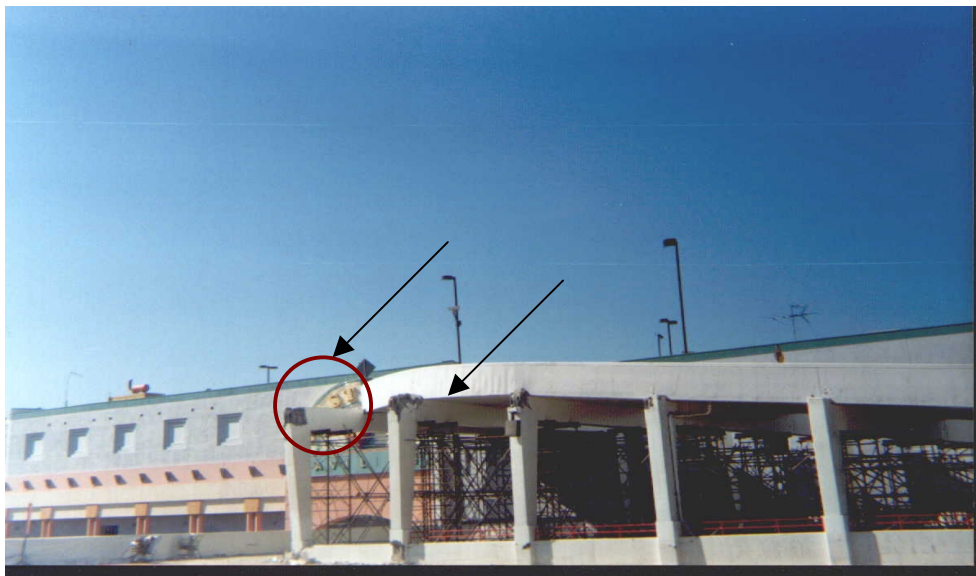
Typical Exterior (Knee) Connection Frame Failure (Photos: A. Mosallam, January 1994)
